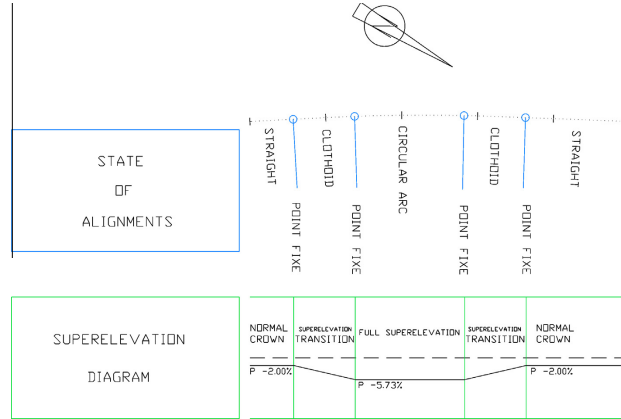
Parameterisation of a road regarding cross-section slopes. Related floor plan of the road (top) and superelevation diagram (bottom) are shown in the diagram.
